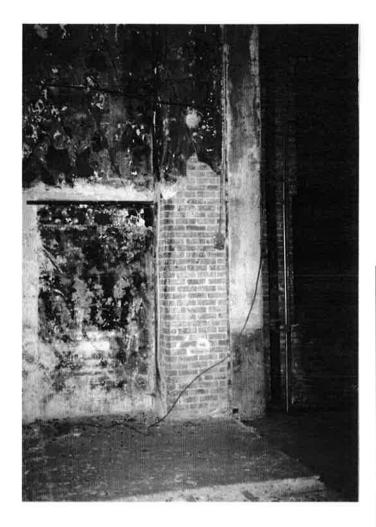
and 30: First-floor interior, front entry - notice fire damage, 1998.
